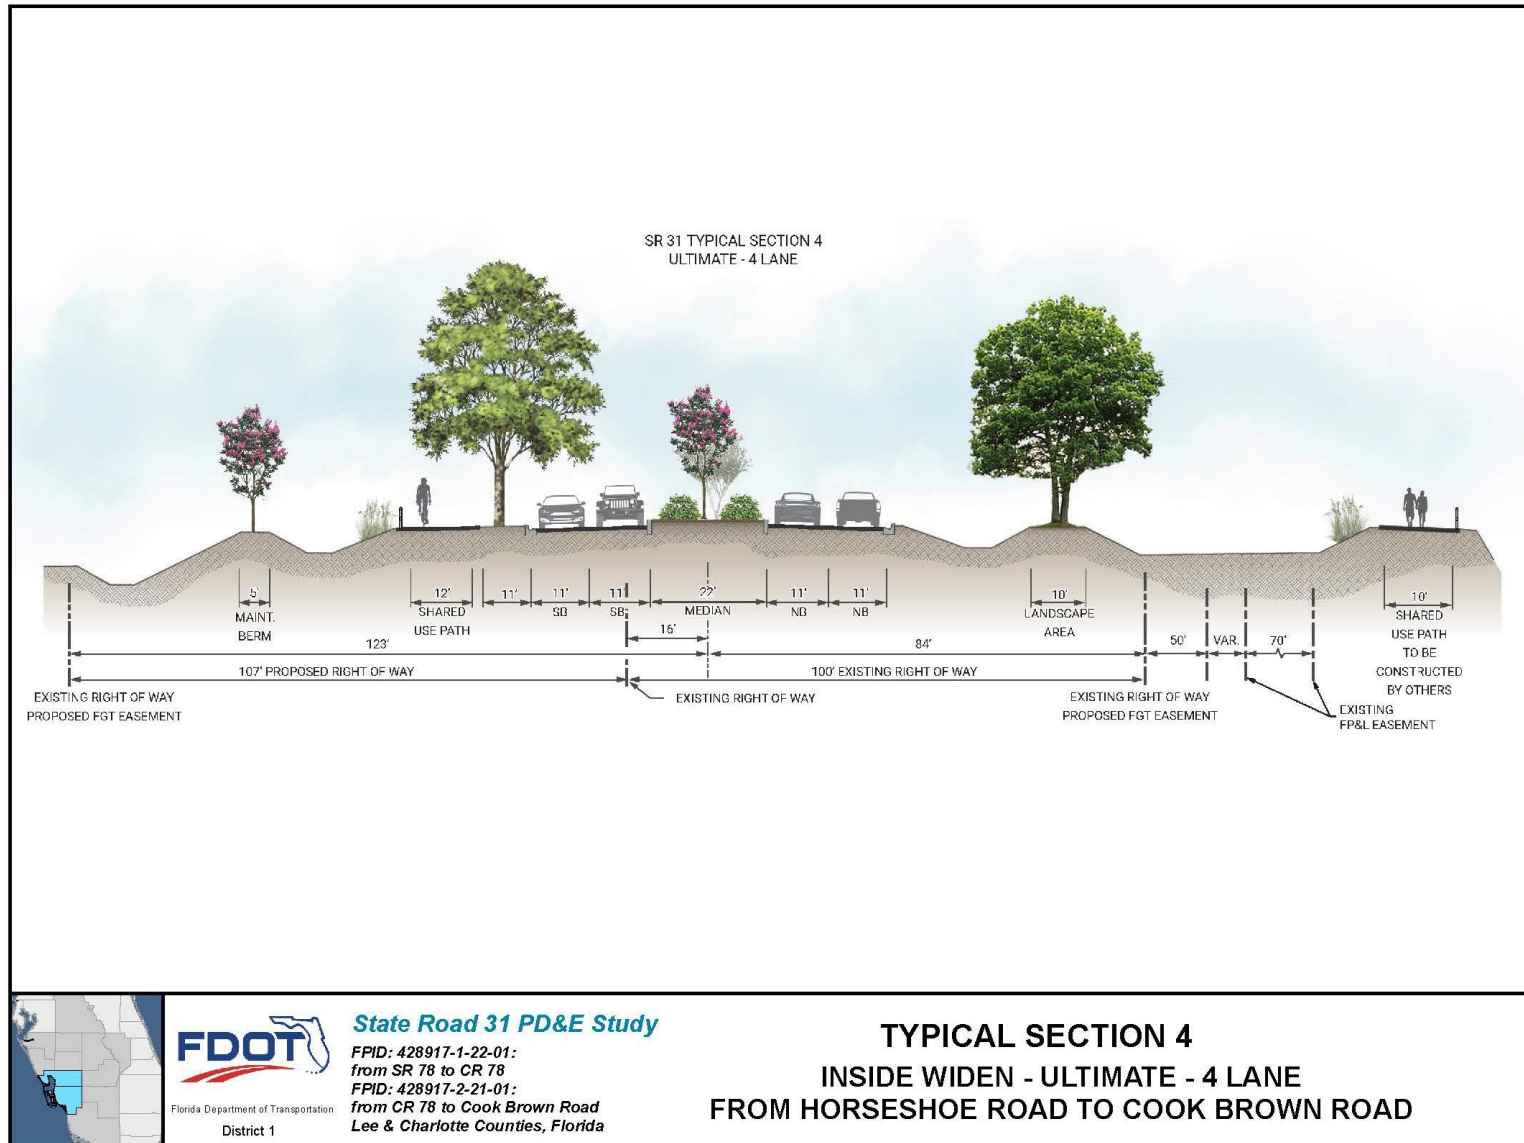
Selected Roadway Typical Section – Horseshoe Road to Cook Brown Road
